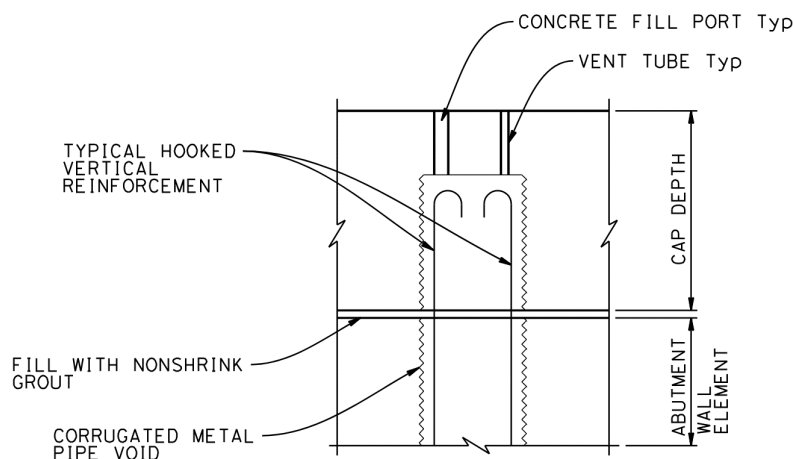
Connection Between Precast Abutment Wall Elements and Wall Cap
